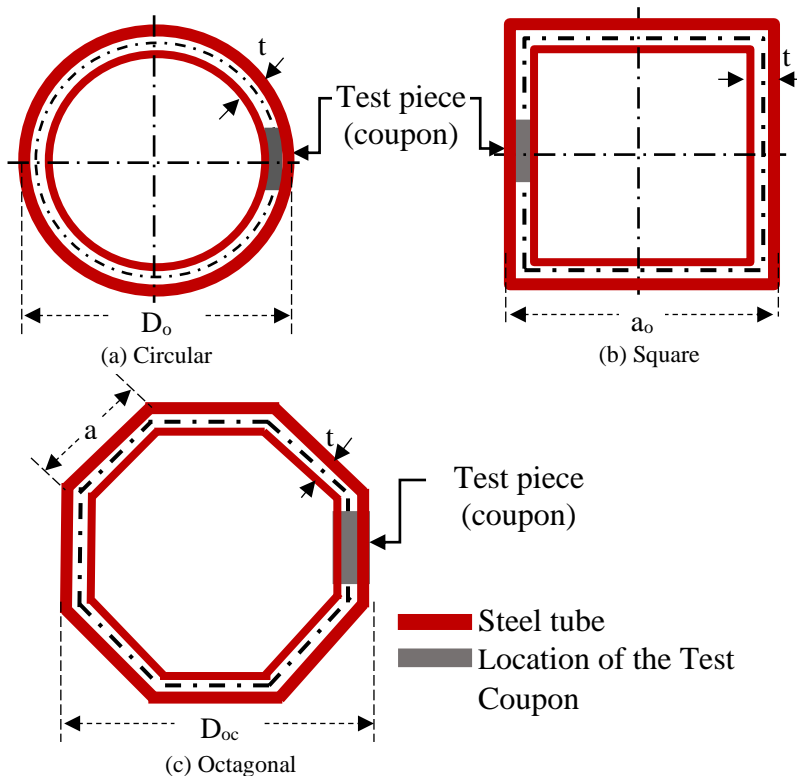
Schematic view of the location of the test coupon for tensile testing of steel tubes.
